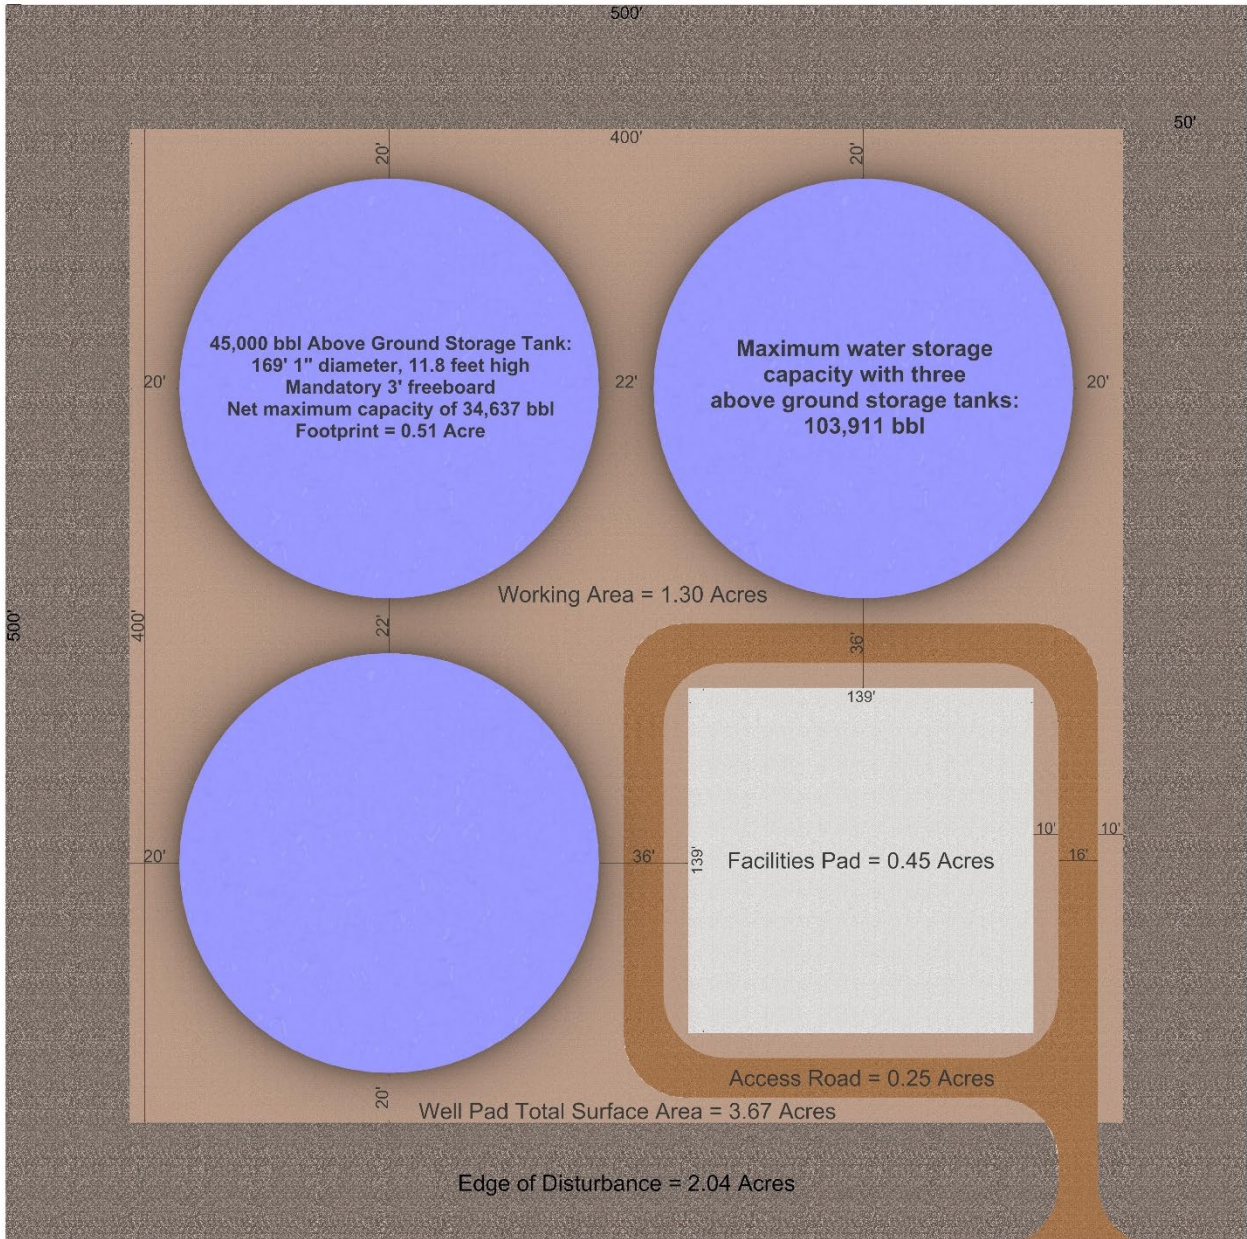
Typical LOGOS Water Containment Layout with Above ground, Open-topped Tanks
